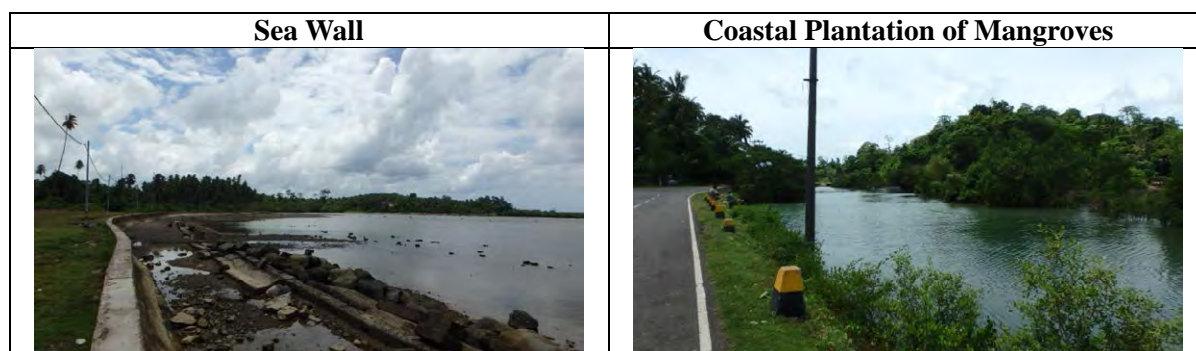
Sea Wall and Coastal Plantation of Mangroves
